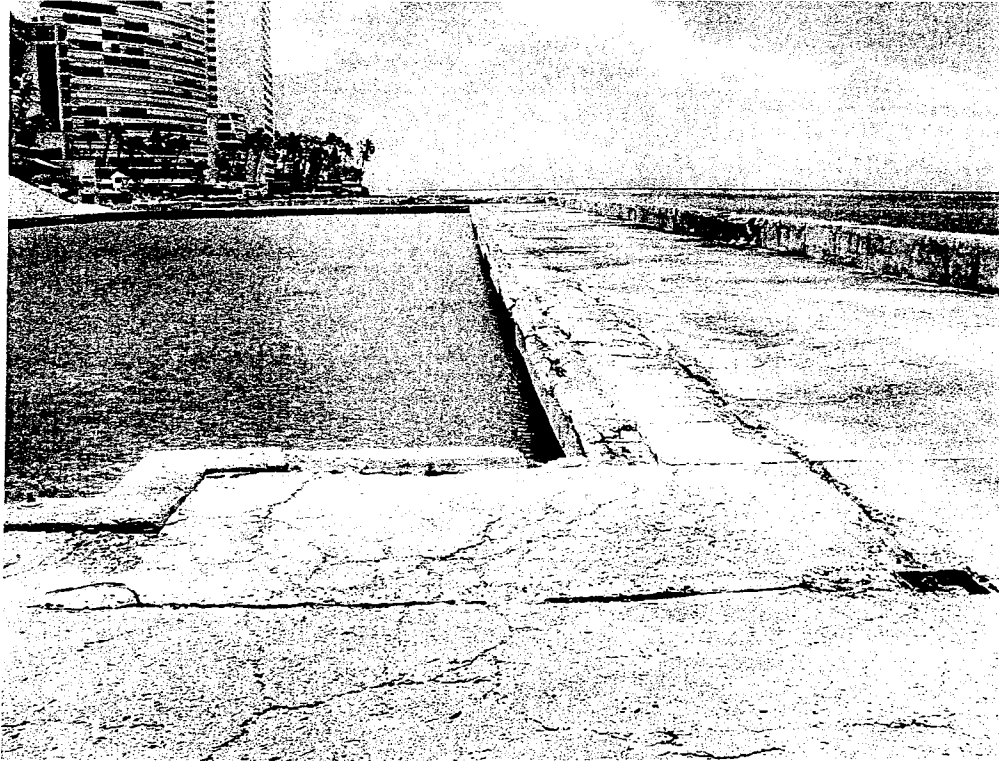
Pool Deck Deterioration at Ewa/Makai Corner
